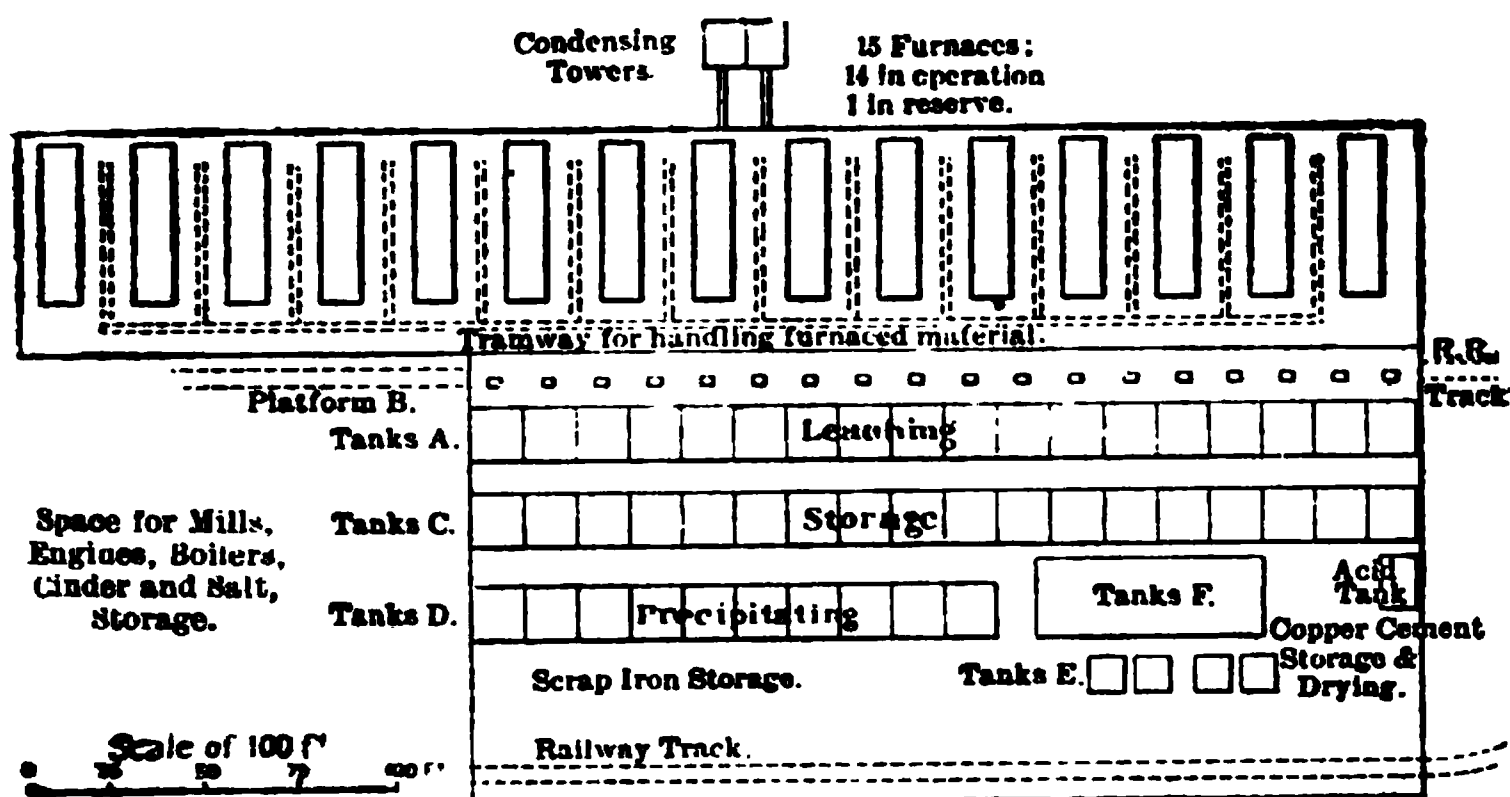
GENERAL PLAN OF LEACHING PLANT, NATRONA.
